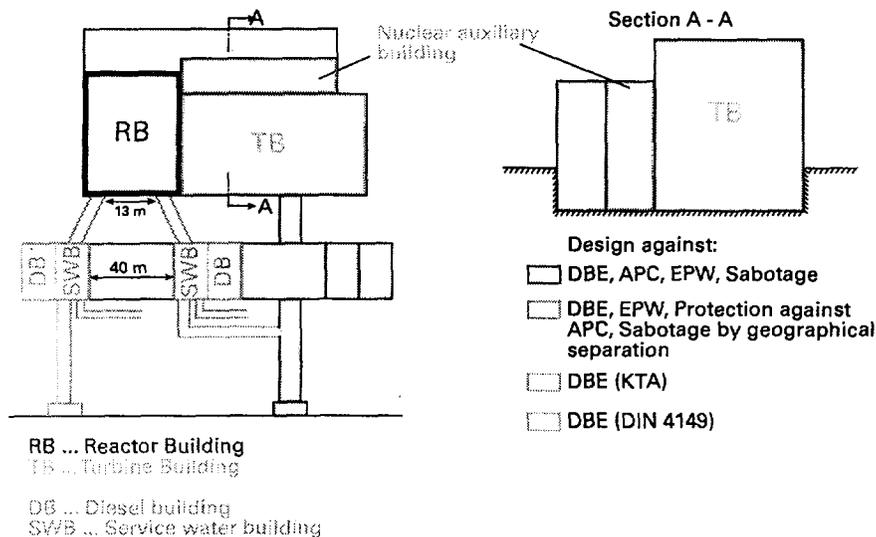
Plant Protection Against Natural and External Man-Made Hazards
